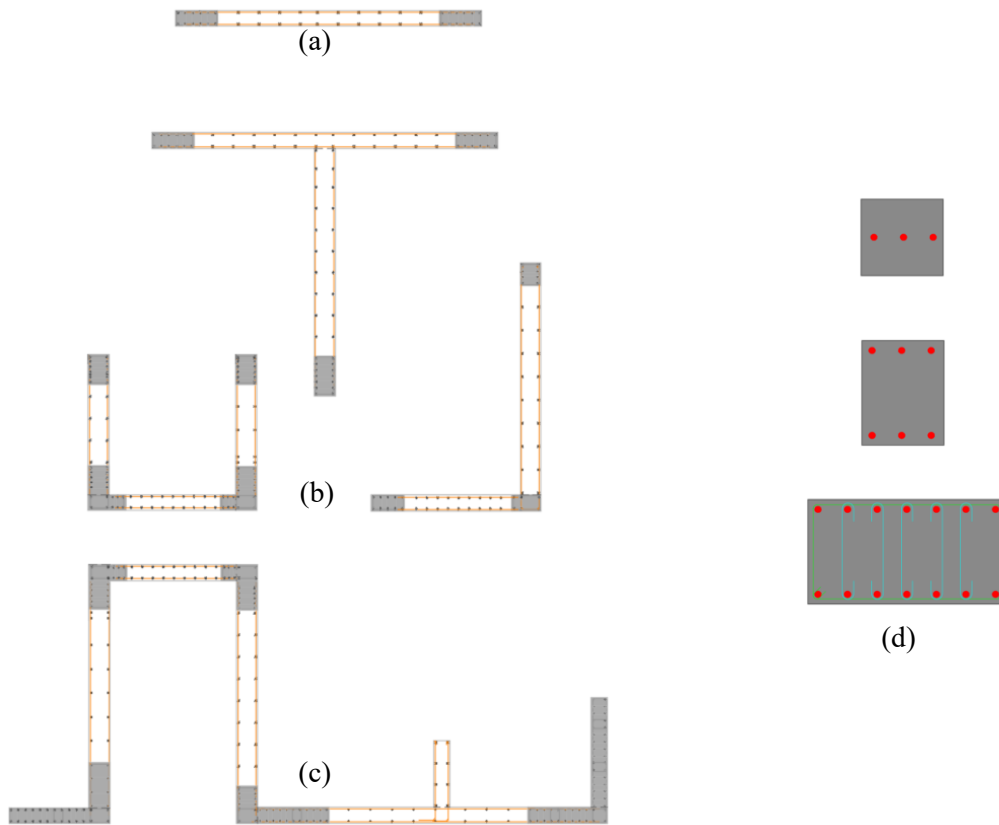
Typical Reinforcement Detail in Reinforced Concrete Walls.
